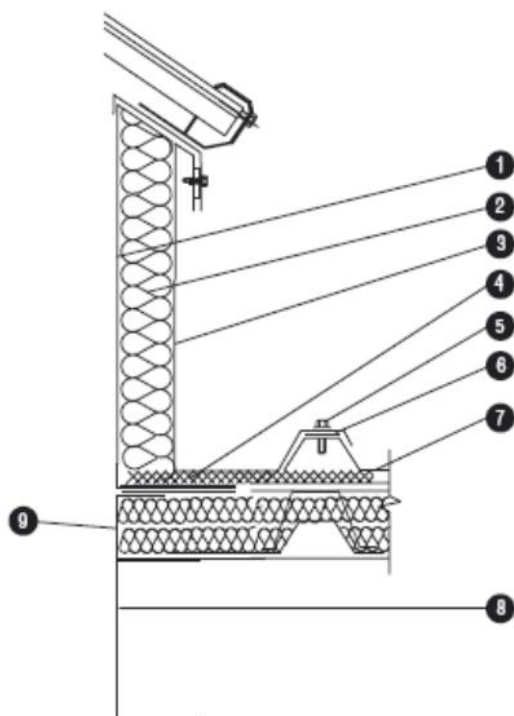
Installation of steel base on the system roofing steel structure with aluminium flashings.
